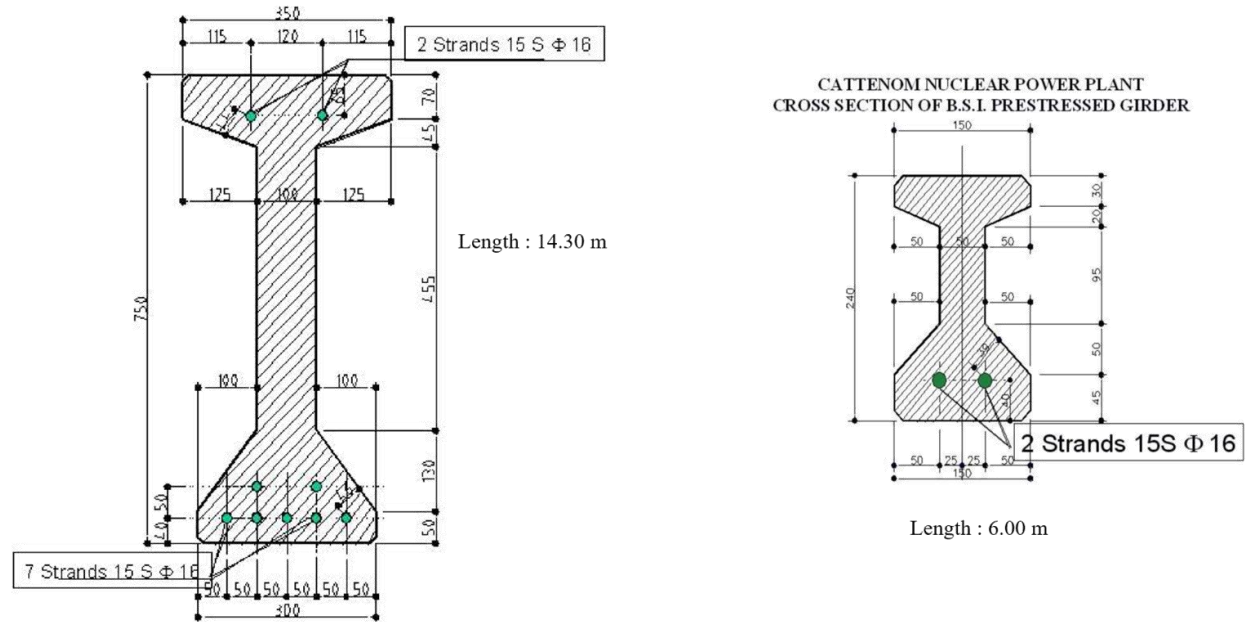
Cross-sections of the UHPC prestressed girders at Cattenom NPP (Birelli, 2009)
